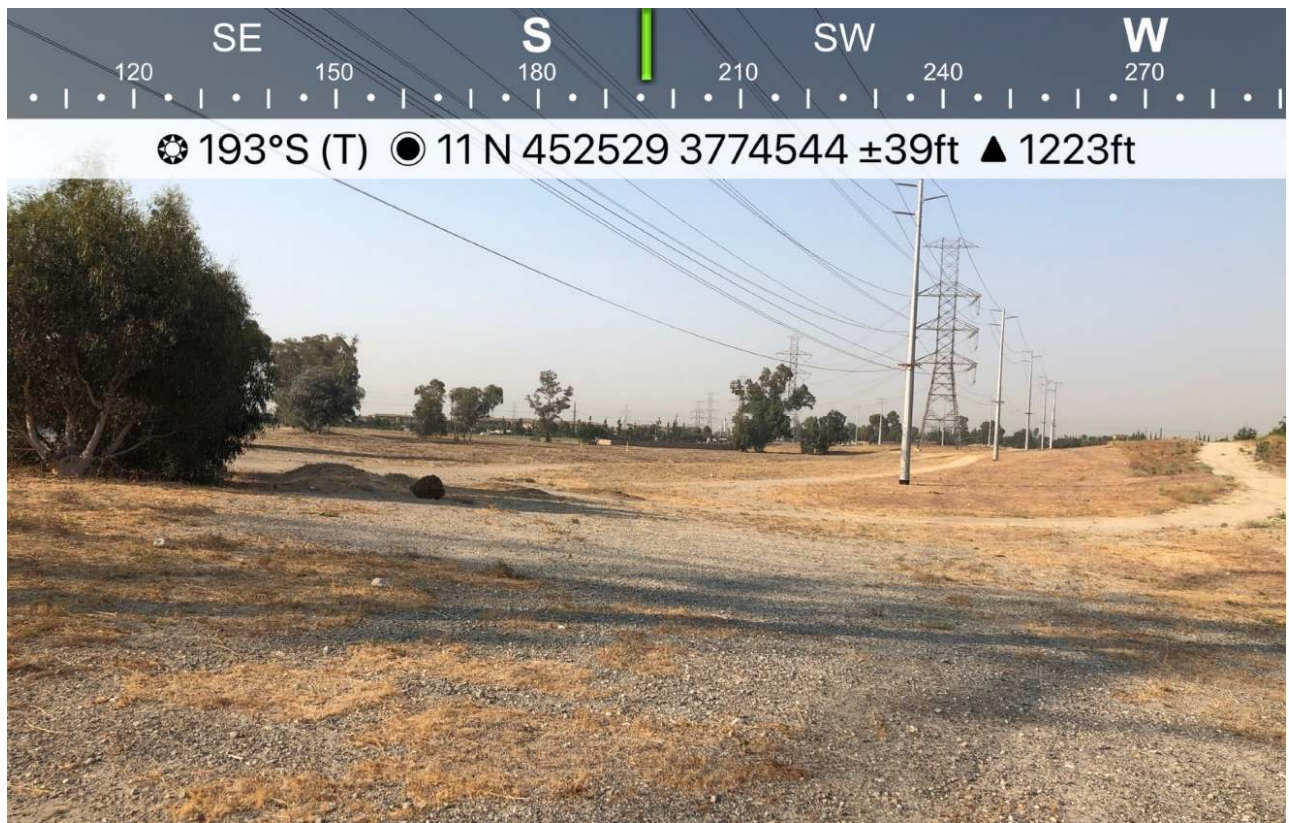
Representative condition of alignment along Etiwanda Avenue, north of the intersection of Etiwanda Avenue and Santa Ana Street.
